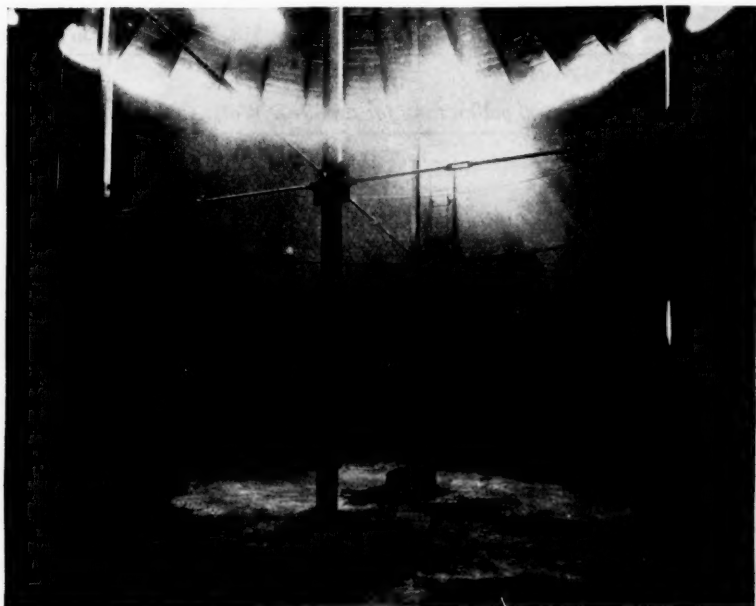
INTERIOR OF FOREST HILL TANK SHOWING ROOF COLUMNS AND
